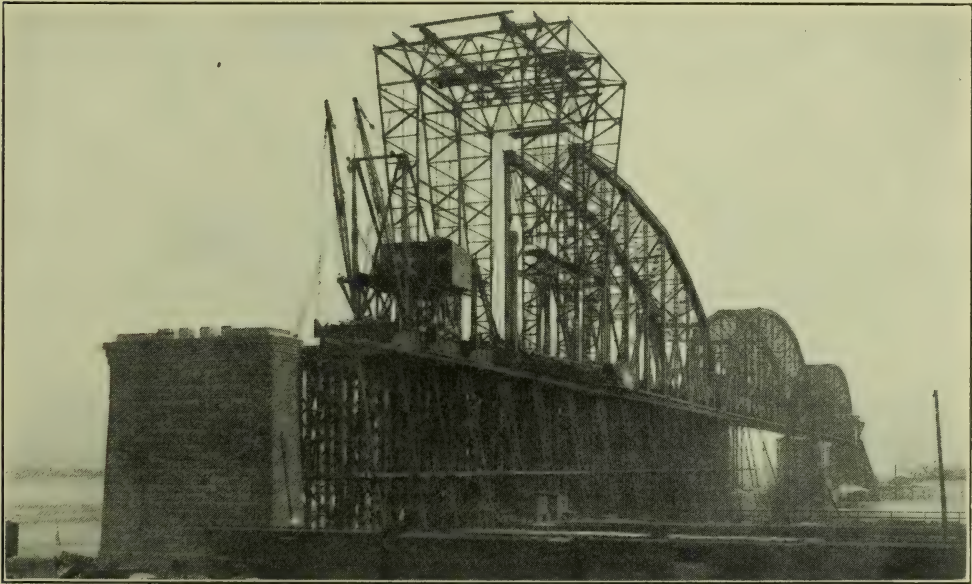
Erecting a Large Truss Bridge on Falsework by Travelling Derrick and Gantry Cranes
